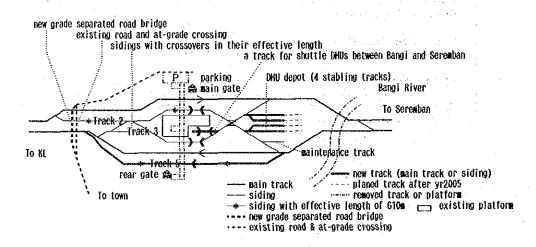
Alternative Track Layout Plan (II) of Bangi Station in RBCS
